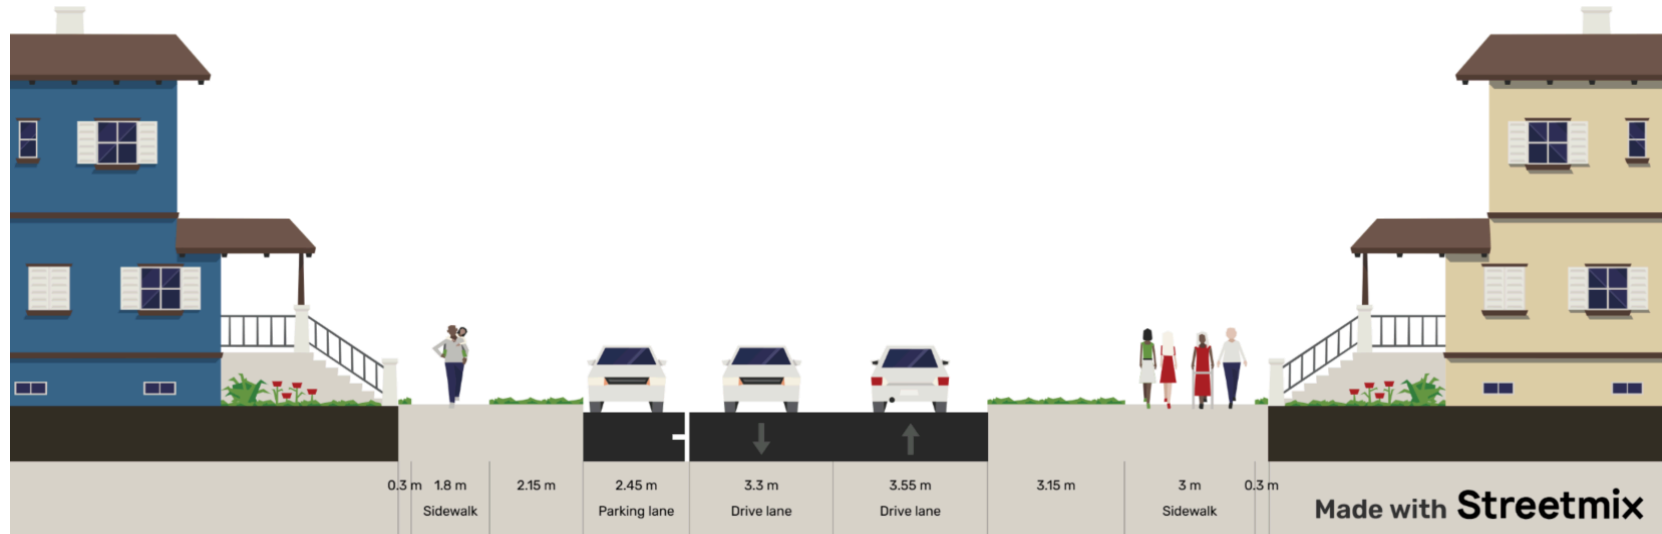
Collector Road Option 2 - 21.5m ROW, 11.5m Road with 1.8m Boulevard walk and 3.0m Boulevard Shared Pathway
